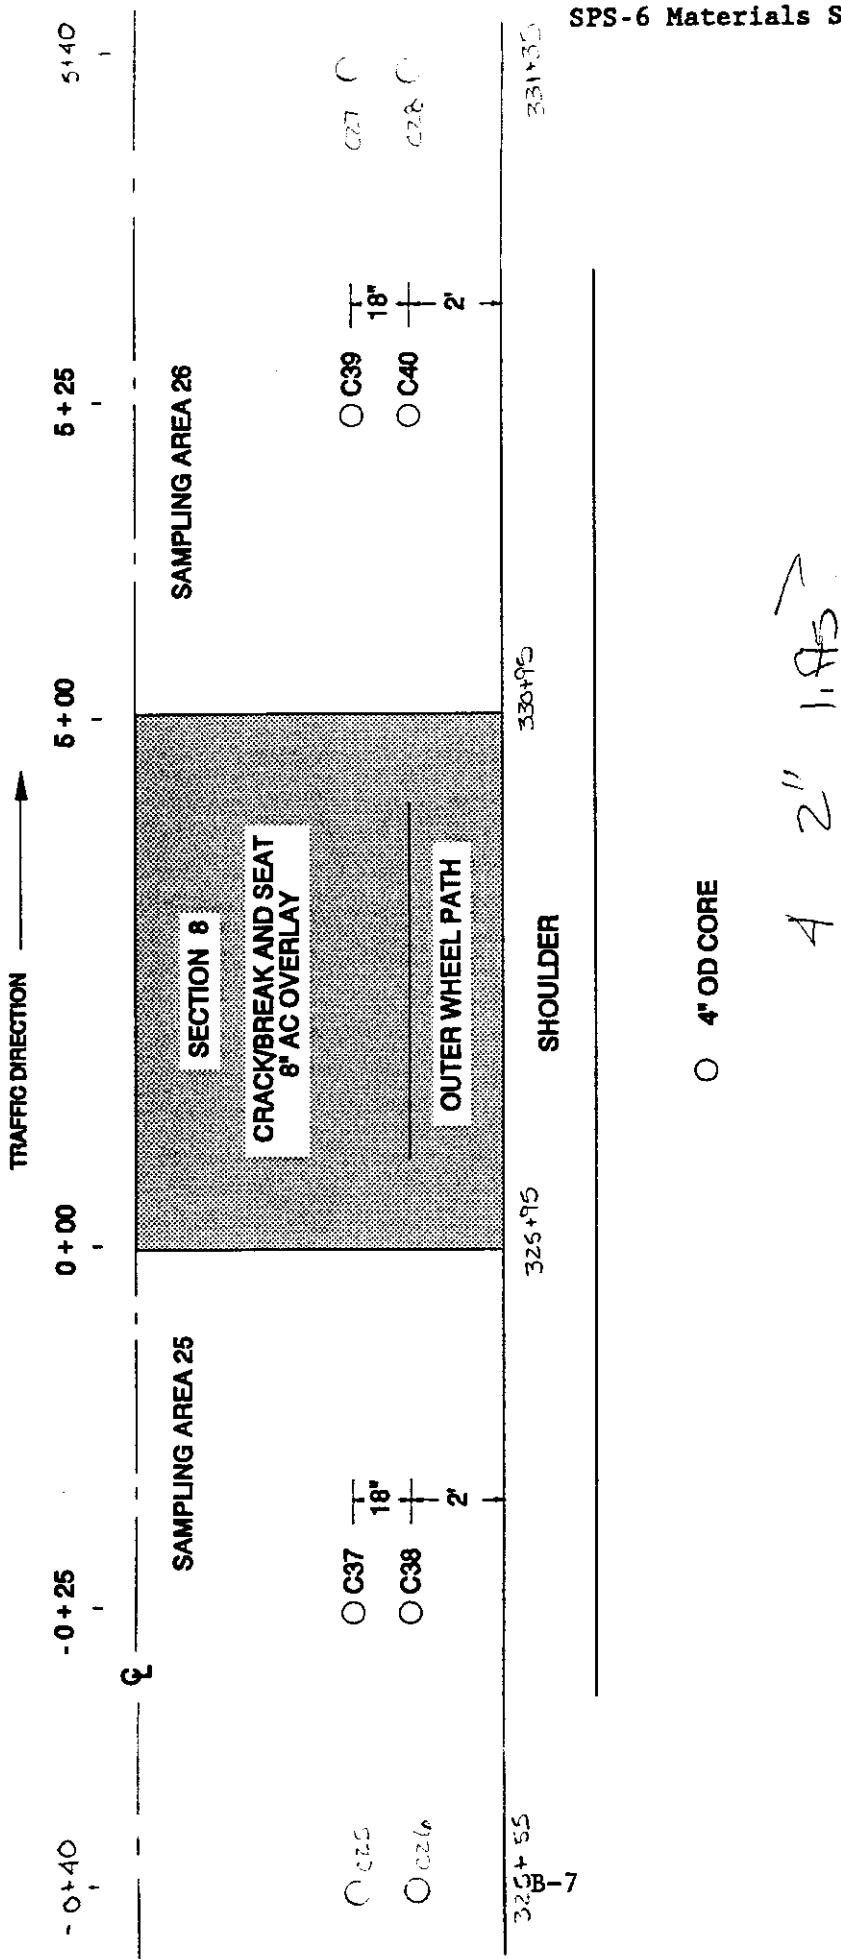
Example of "Post-Construction" Sampling Plan for Test section 8
